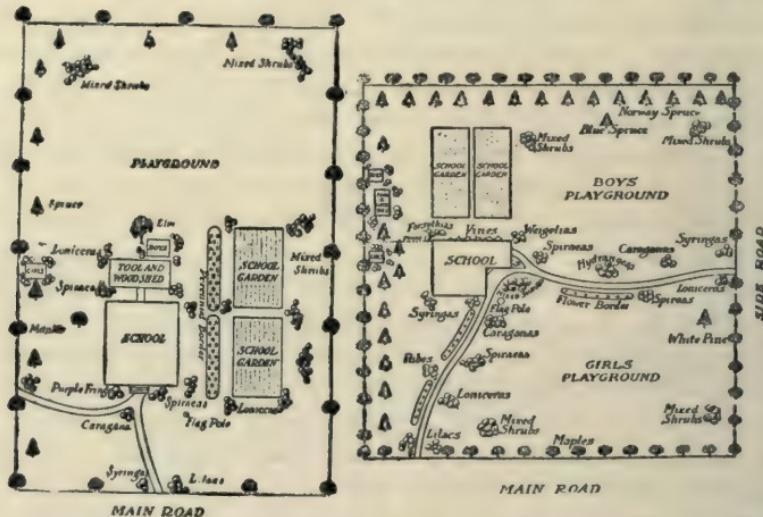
Plans for improved rural school grounds of about two acres or less, showing areas for gardens and play. (Arkansas Department of Public Instruction and U. S. Bureau of Education.)
